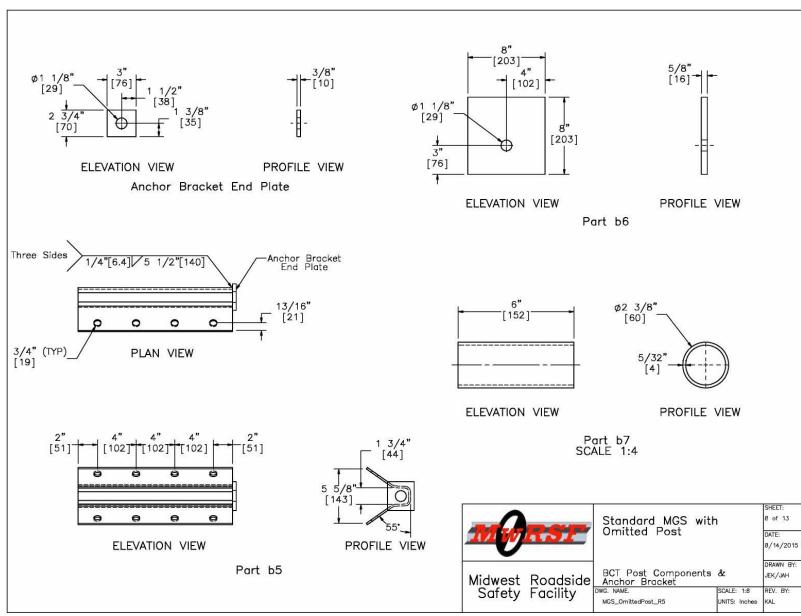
BCT Post Components and Anchor Bracket, Test No. MGSMP-1
